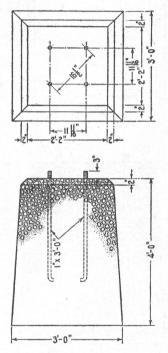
Ground Signal Mast Foundation R. S. A. drawing 1107, dated 1909. (30.25 cubic feet of concrete.)
